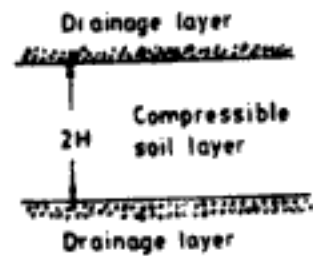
Compressible soil layer with two-way drainage and subjected to ramp loading
